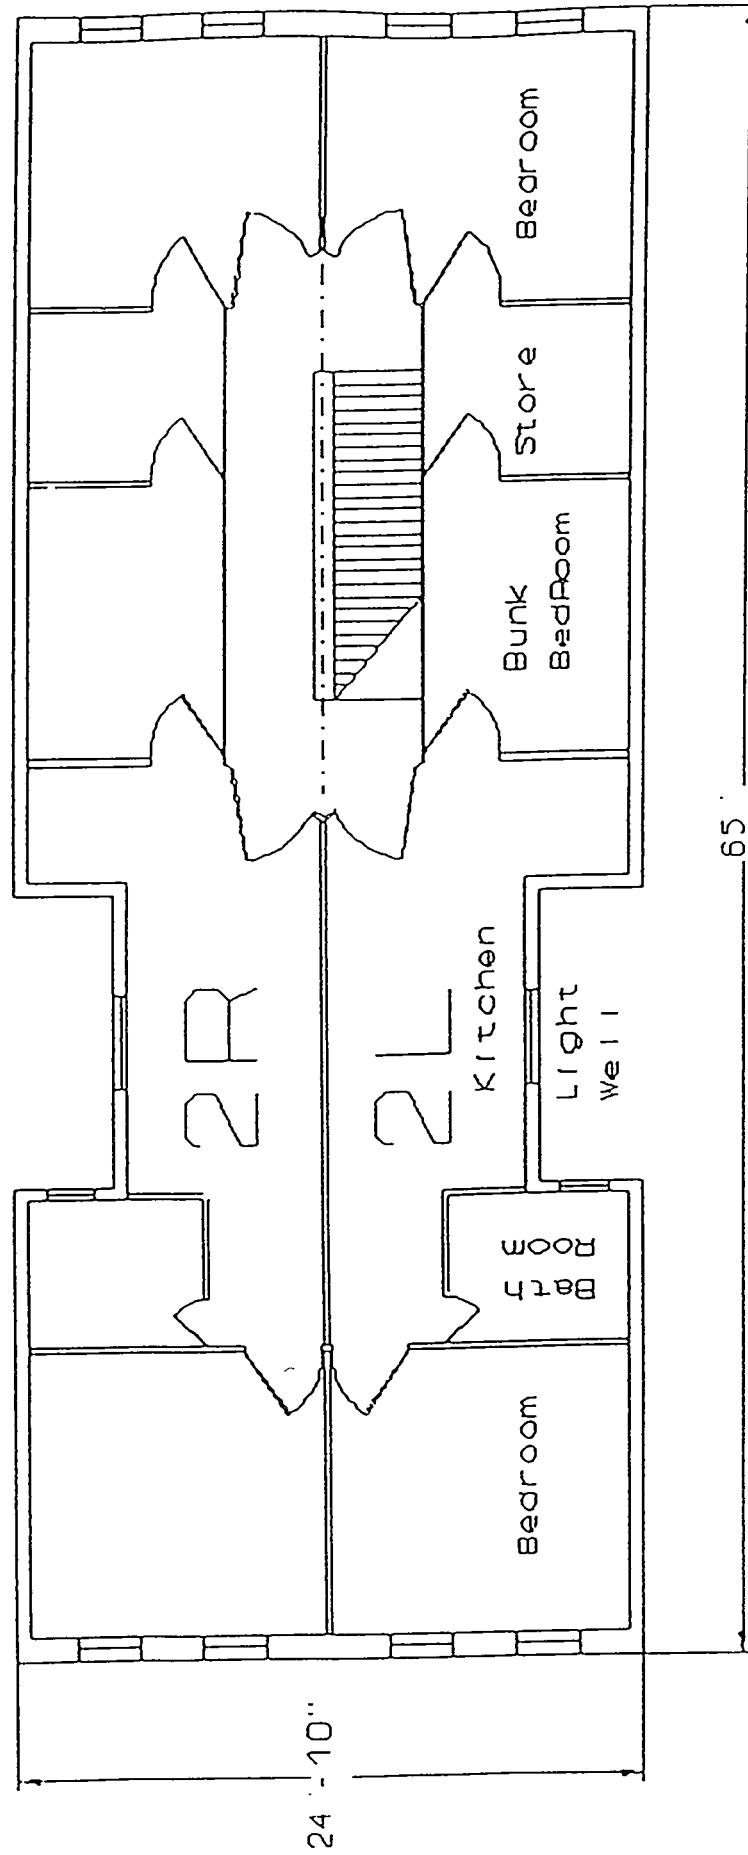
Typical Floor Plan at 1348 Willoughby Ave., Brooklyn, New York City
